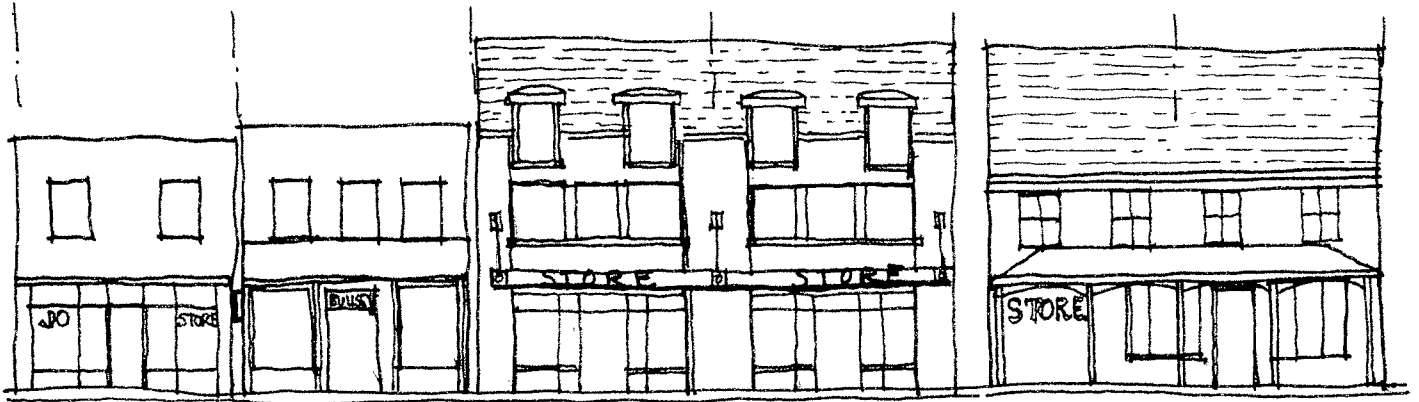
Appropriate infill development. Street wall preserved and enhanced. Bay sizes conform to historic scale, common horizontal lines are repeated, 2 or 2½ stories are appropriate, pedestrian/street-oriented storefronts, pedestrian detailing of canopy, recessed doorways, and scale of signage and materials are of the traditional palette; all of this adds up to a positive reinforcement of the street and a comfortable fit between new and old. Further, a restoration approach of the historic buildings substantially improves their appearance.
